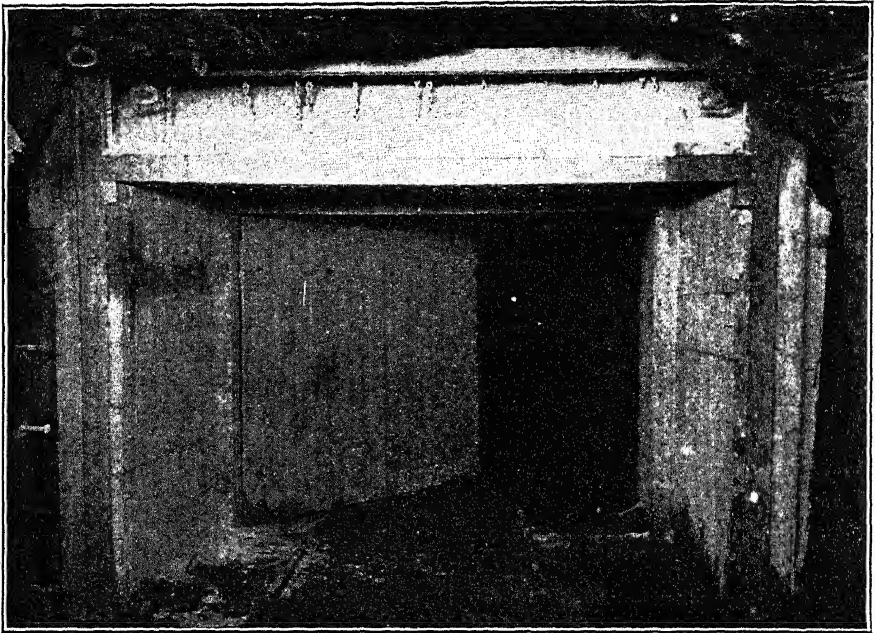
ROCK-DUST PROTECTED DOOR WITH FRONT BOARD REMOVED TO SHOW LOOSE CHAINS TO SUPPORT BOARDS OVER DOOR FRAME IF EXPLOSION OCCURS. TAKEN BEFORE SUCCESSFUL OPERATION.
